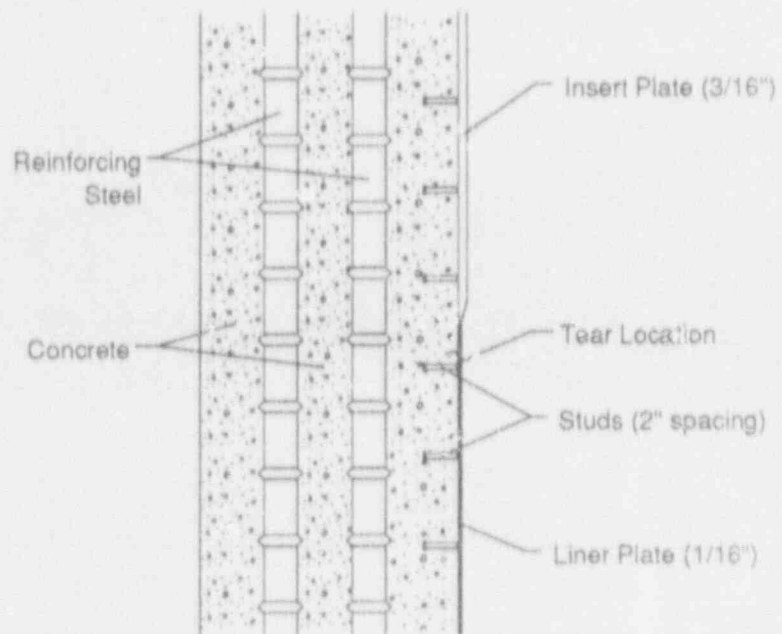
Top View of Cross-Section Through Reinforced Concrete Wall
